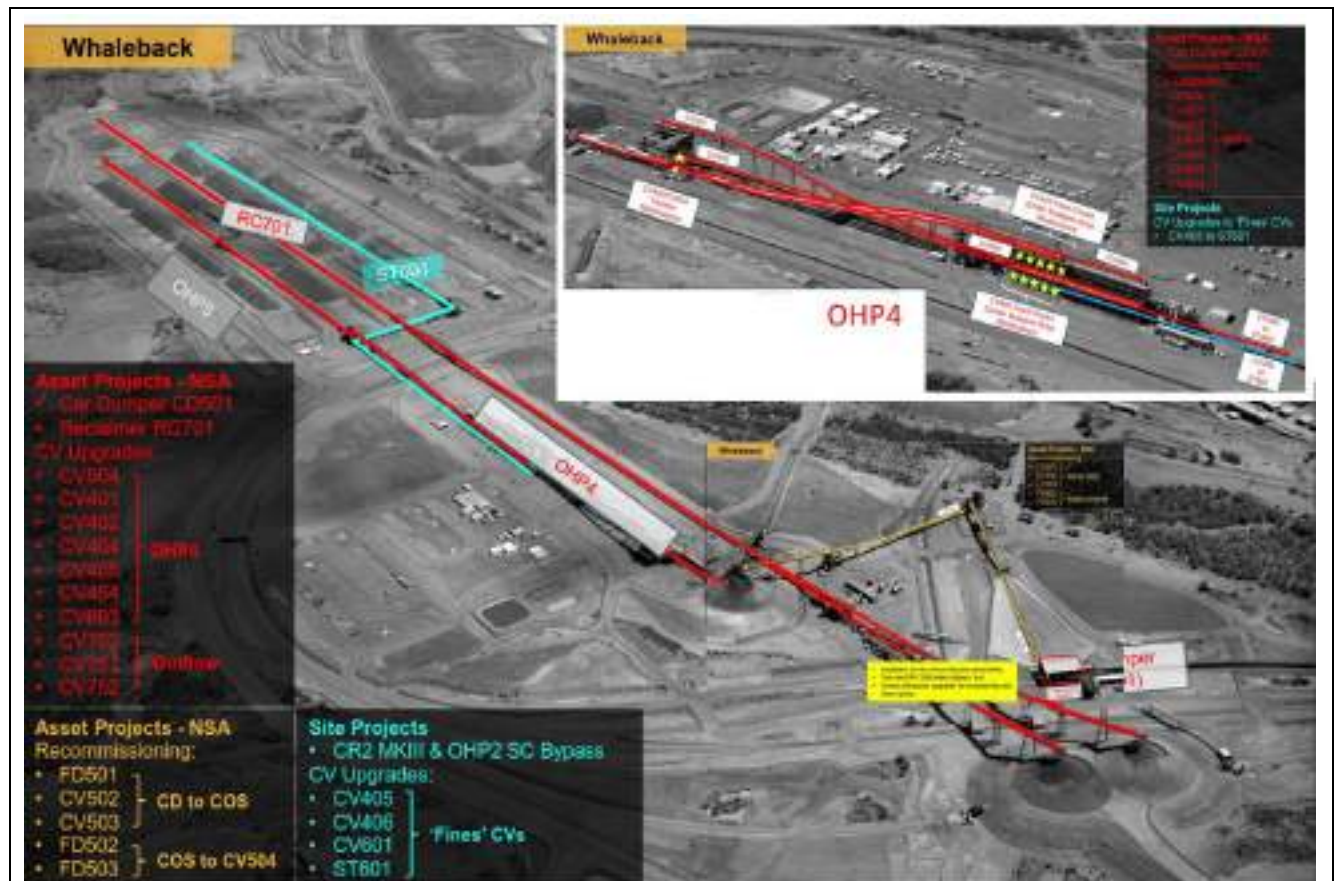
Ore Handling Plant 4 and Car Dumper Upgrades
